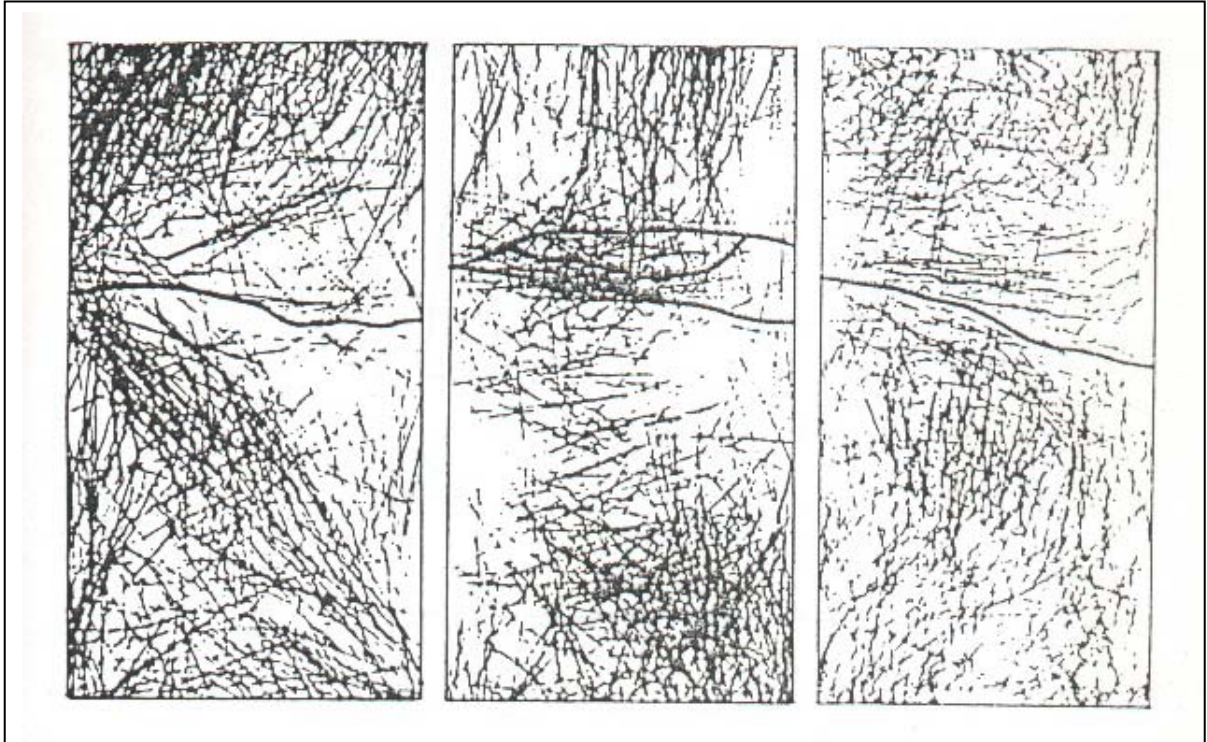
Cracking at the Weakest Section in Uniaxial Tension
